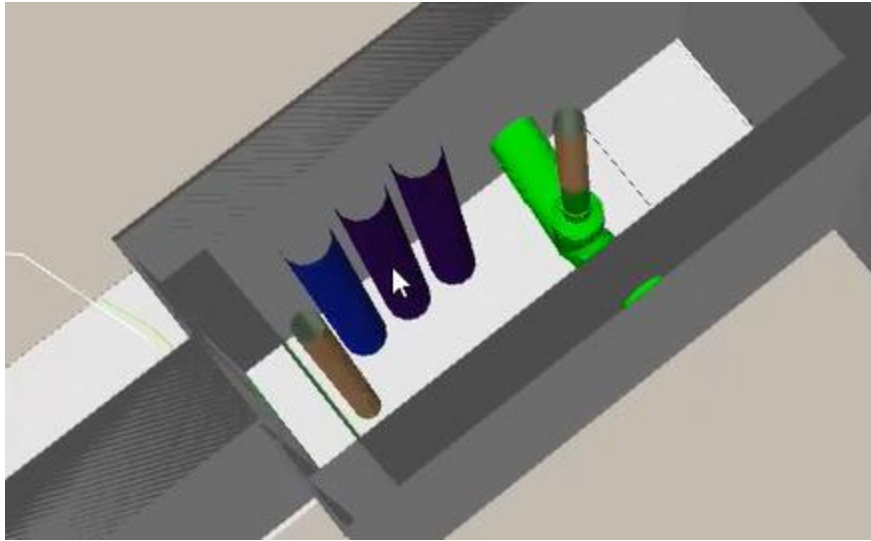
Plumbing pipes (green) and electrical conduit pipes (Dark blue) inside a plumbing chase.
